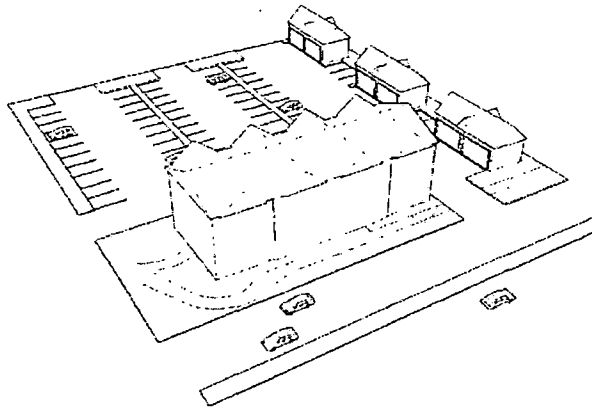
H: Multi-family detached garages with roof dormers
